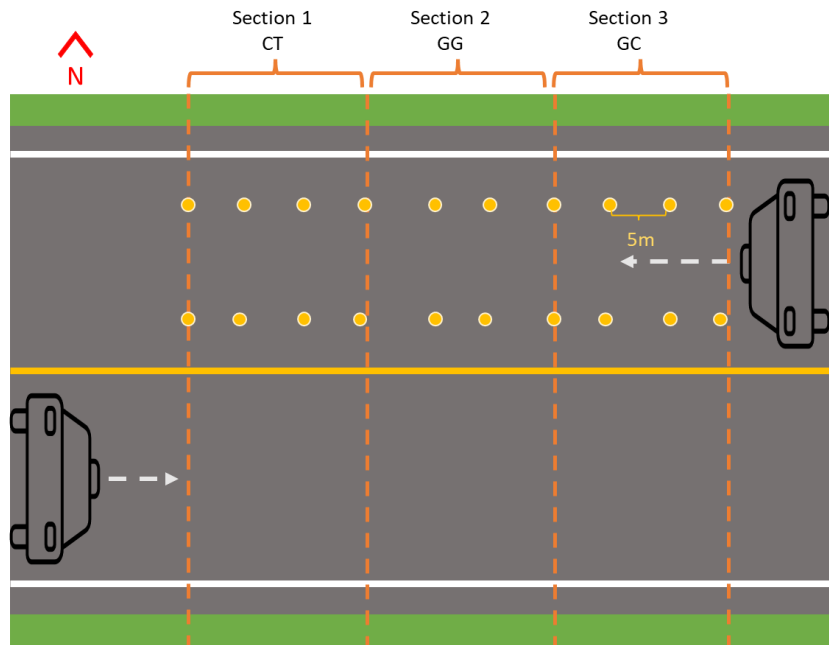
LWD Testing Points on Asphalt Surface During Construction
